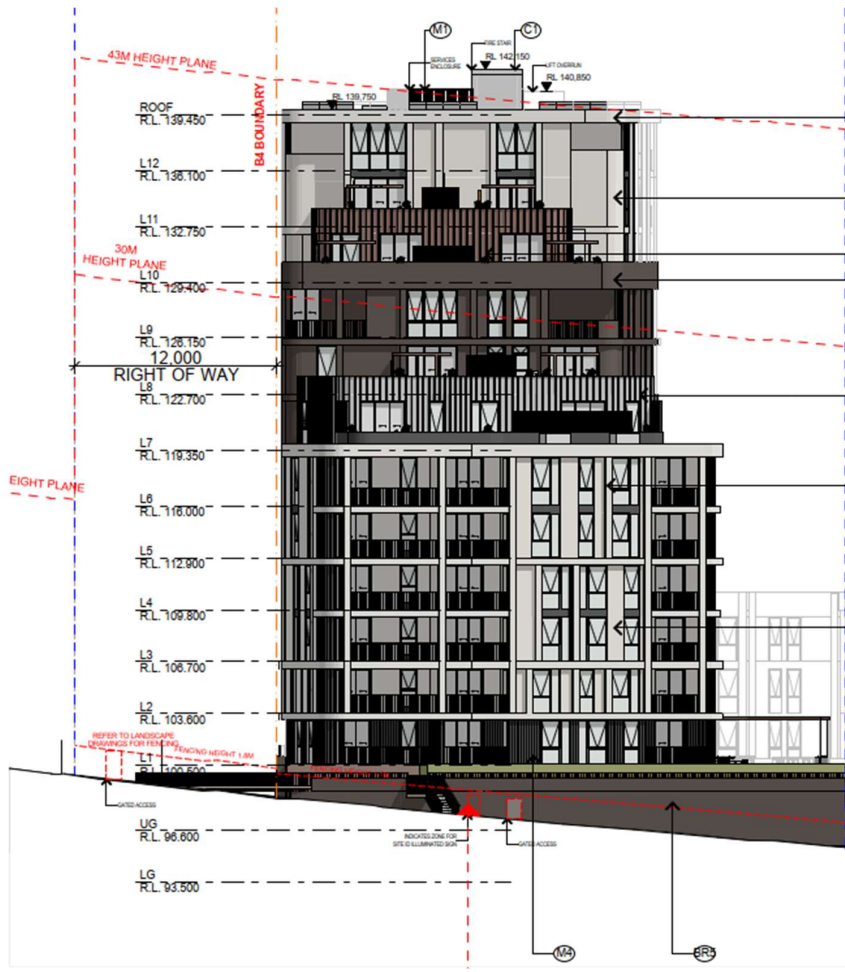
Approved and Proposed Building-D South Elevation James Street (4 of 4)
